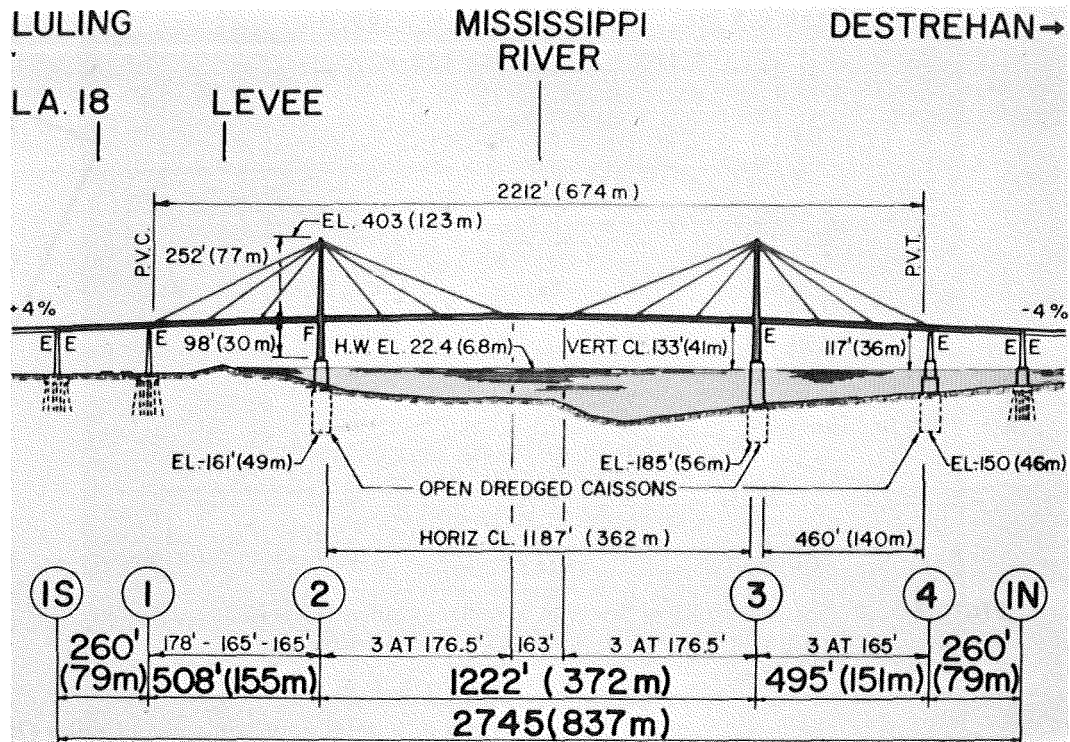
Luling Bridge, span layout, from reference 33.
